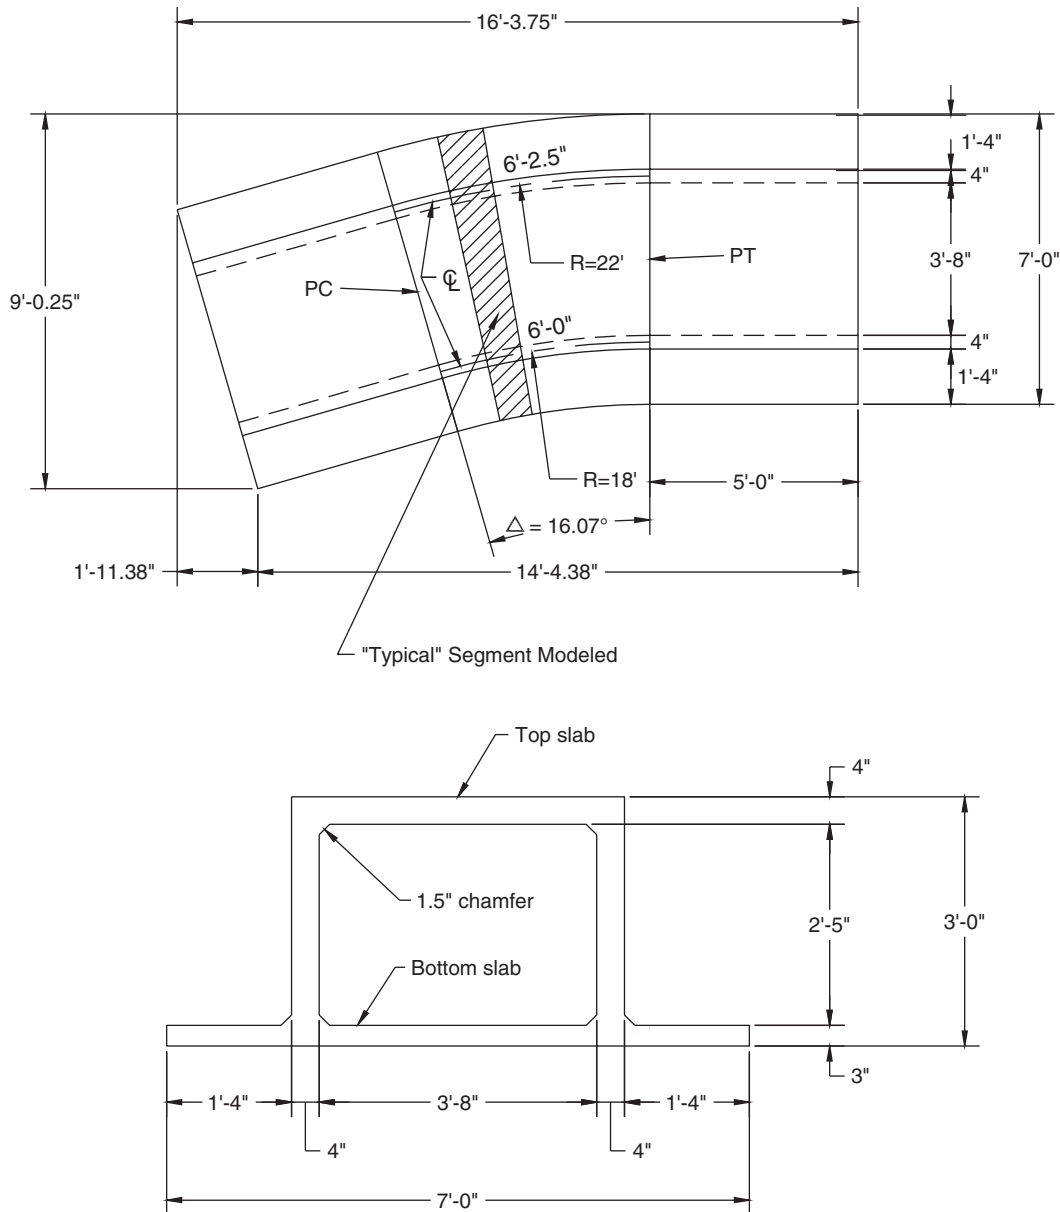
Plan and end view of U.T. girder test specimen (from Van Landuyt, 1991).
